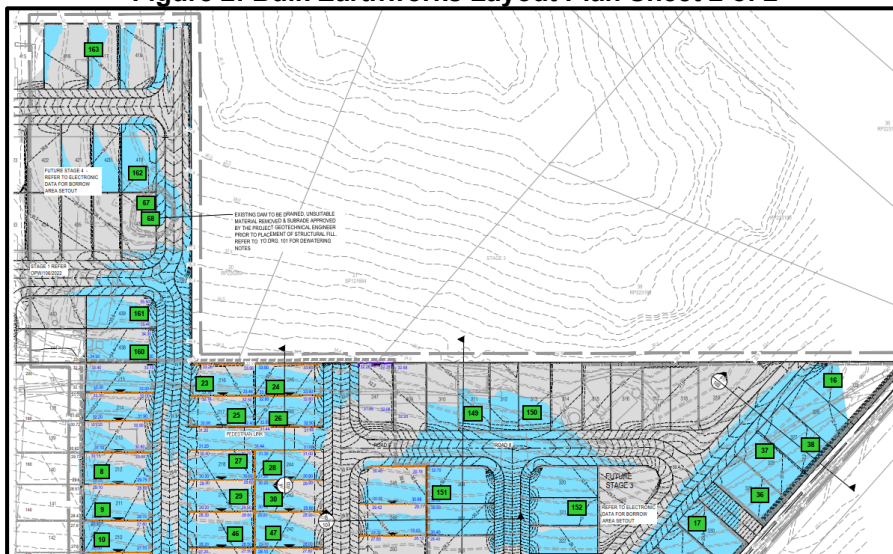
Bulk Earthworks Layout Plan Sheet 2 of 2
